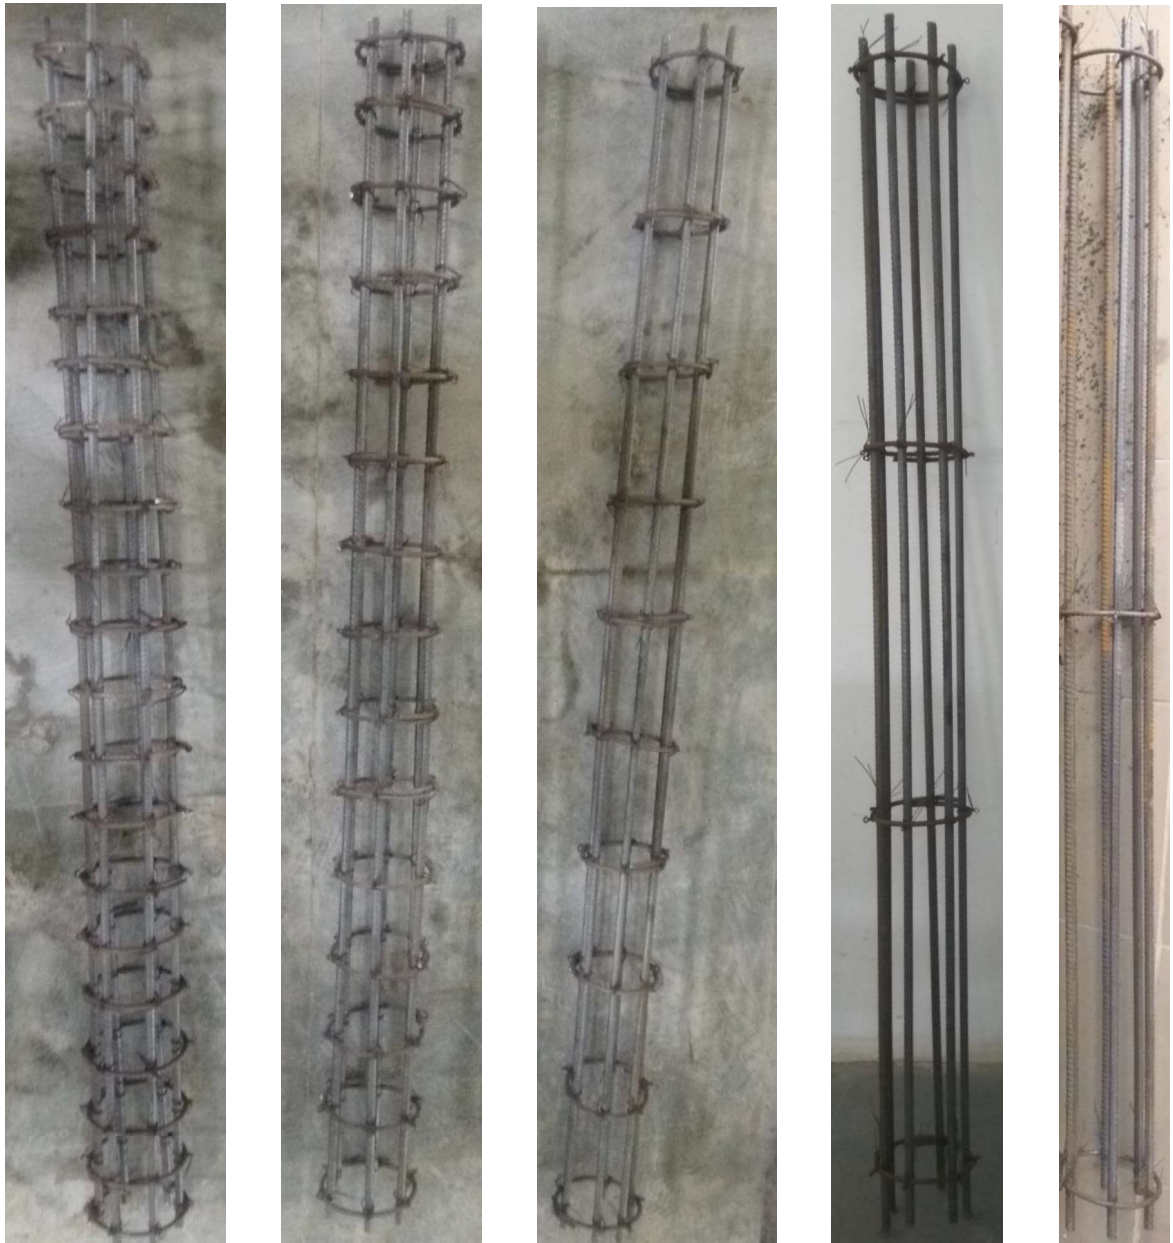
Shear reinforcement at 75 mm, 100 mm, 150 mm, 450 mm and 700 mm spacing
